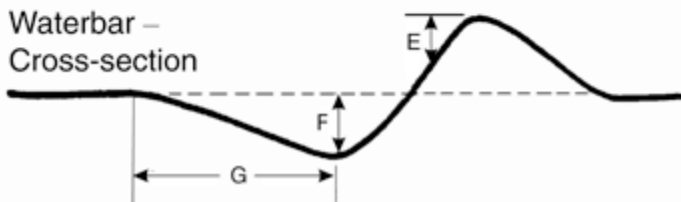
Water bar construction for forest or ranch roads with little or no traffic. Specifications are average and may be adjusted to site conditions.
